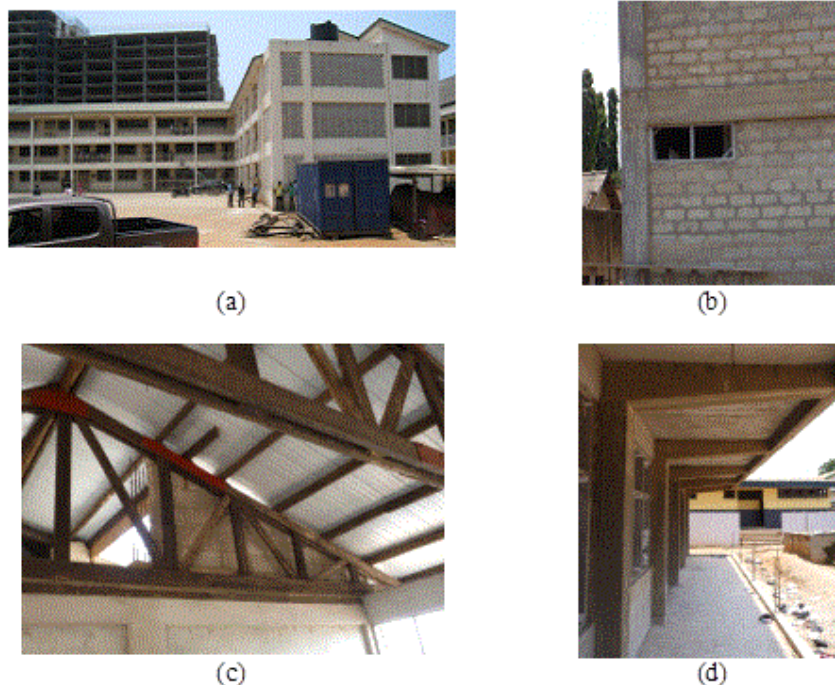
Typical school building (a) Senior High School block, (b) Sandcrete block wall in tight contact with reinforce concrete frame, (c) Roof trusses, (d) Cantilevered walkway
